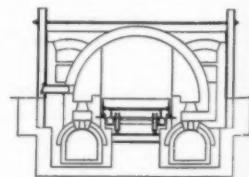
Section of old type continuous furnace with burners ports on both sides.
